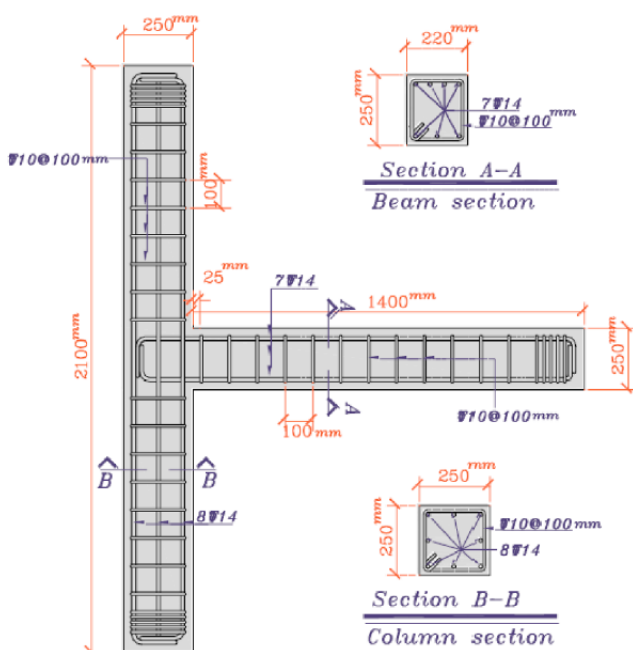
NS and R2NS BCJ specimens – dimensions and reinforcement details [24]
